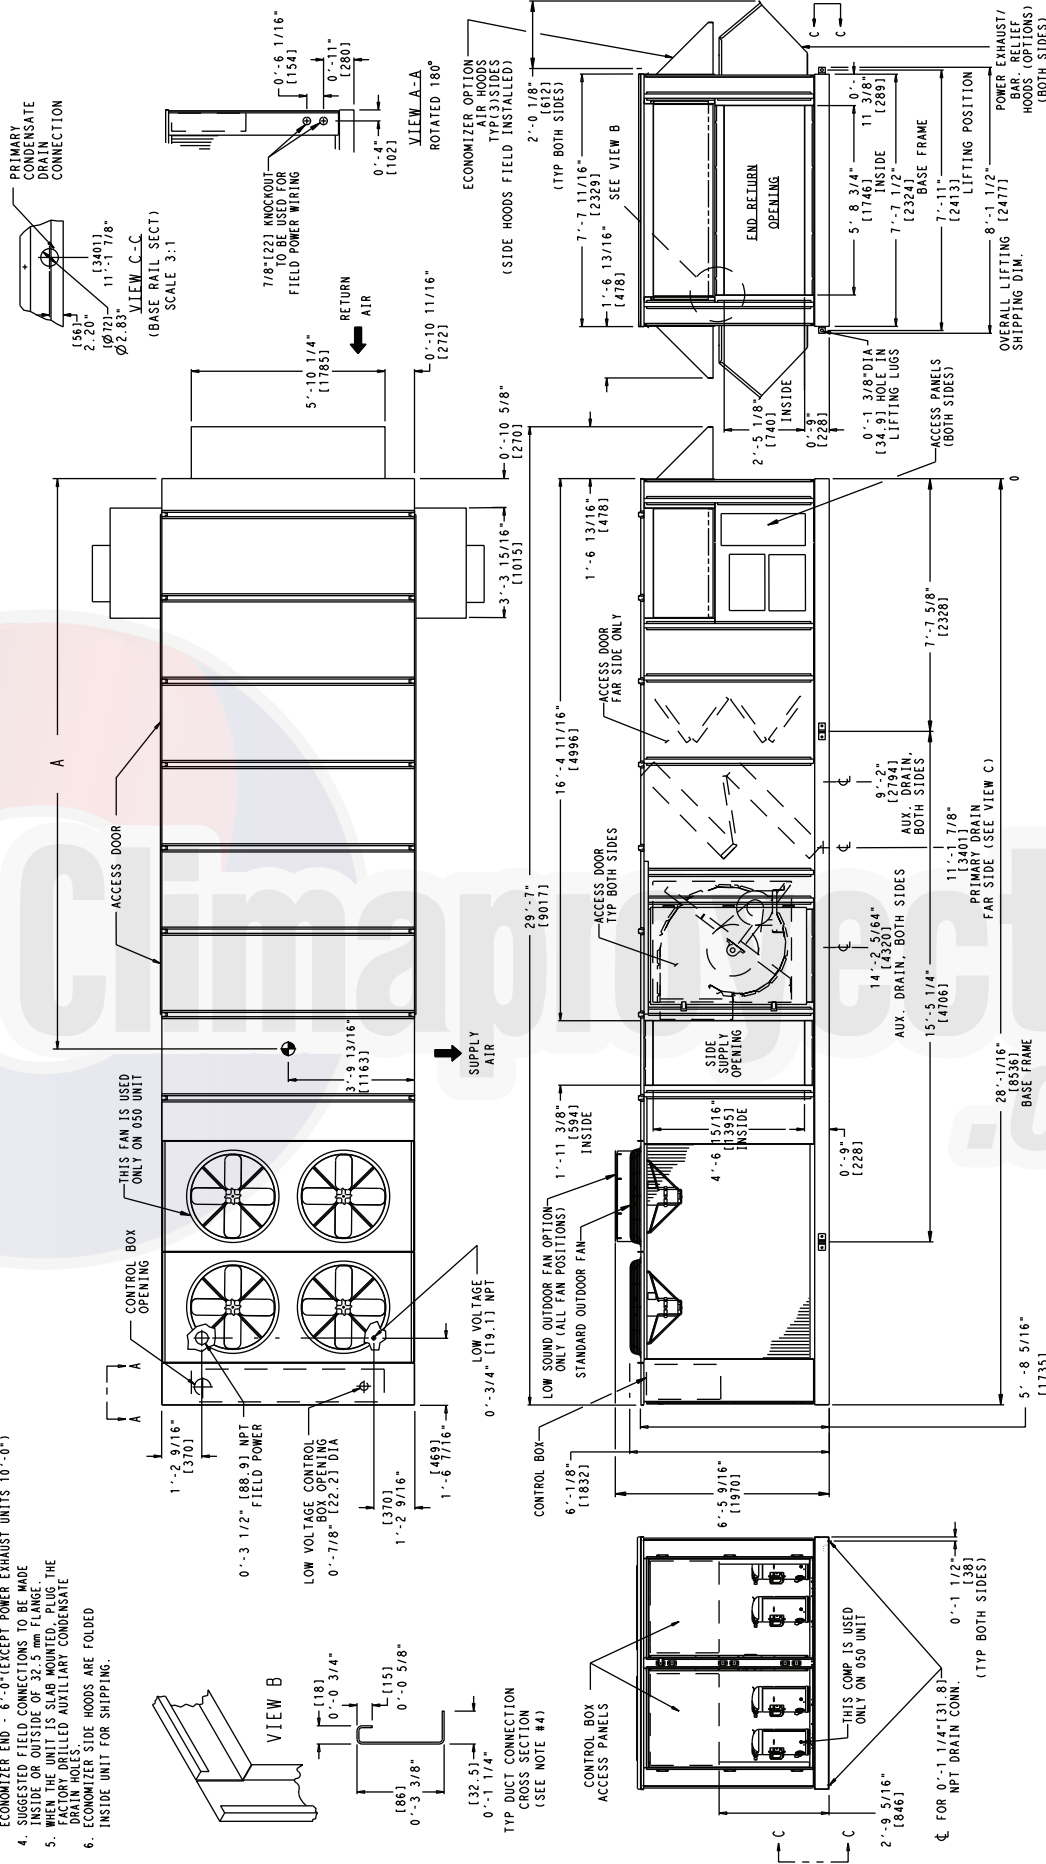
Base Unit Dimensional Drawing — 50P4, P5, P8, P9040-050 (Standard Chassis Unit Shown)
